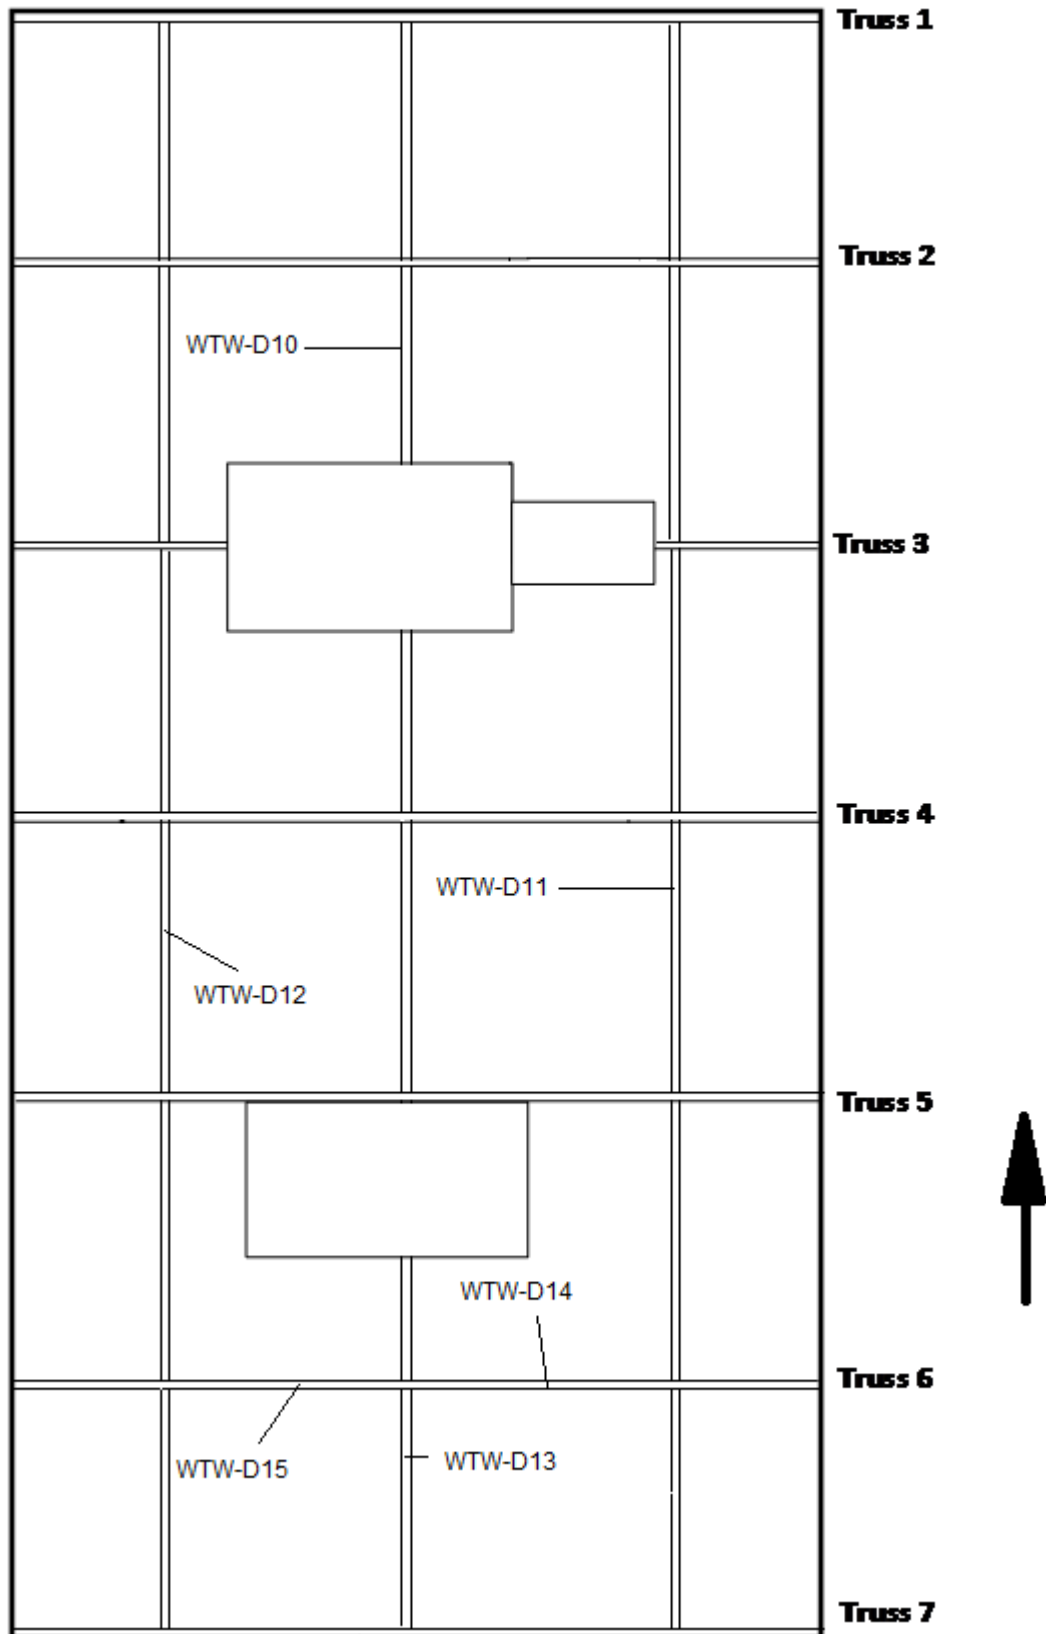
The House; sketch plan of farmhouse roof, showing the location of samples WTW-D10-15
